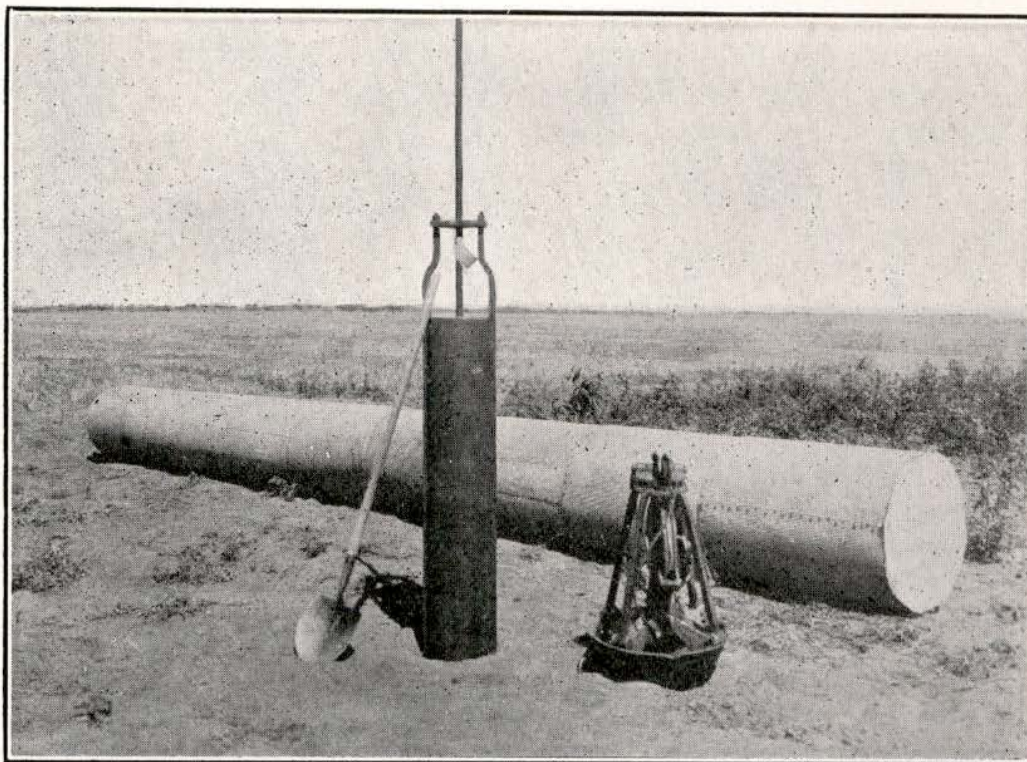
Showing orange peel bucket and suction bucket which are used in digging the irrigation well. Also shows the well casing riveted together, ready for lowering into the well
